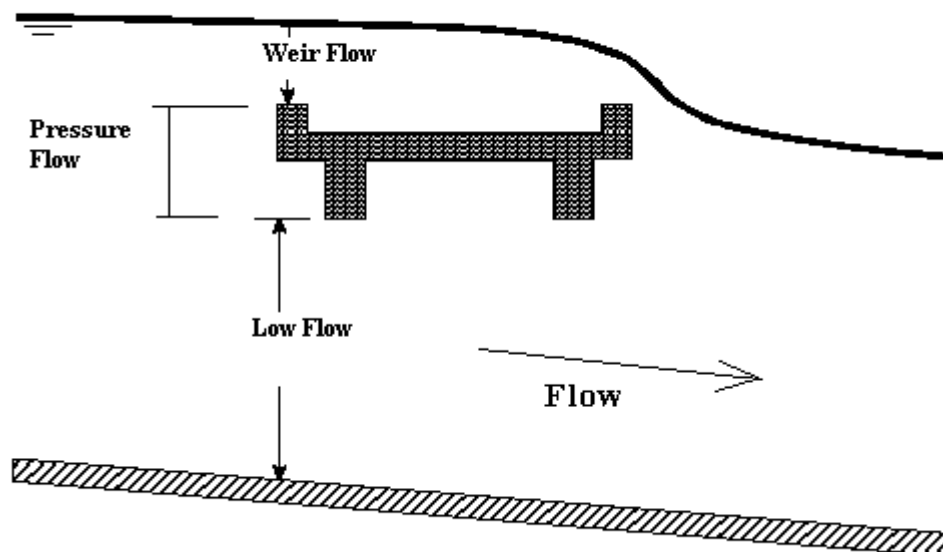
Low Flow, Pressure Flow, and Weir Flow Through A Bridge Opening
